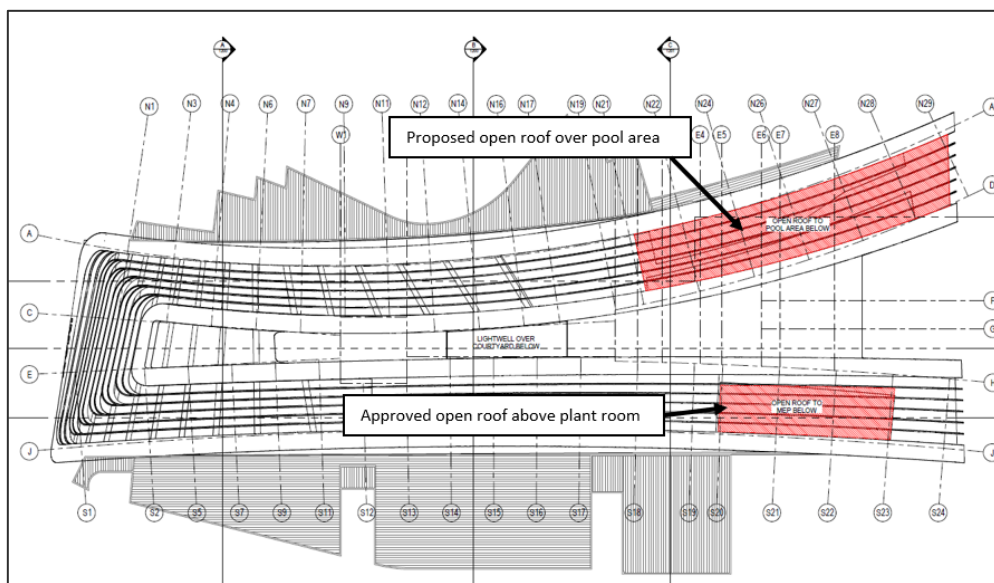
| Roof plan showing proposed open roof area above level 22 pool area (Base source: Applicant's Architectural drawings).
